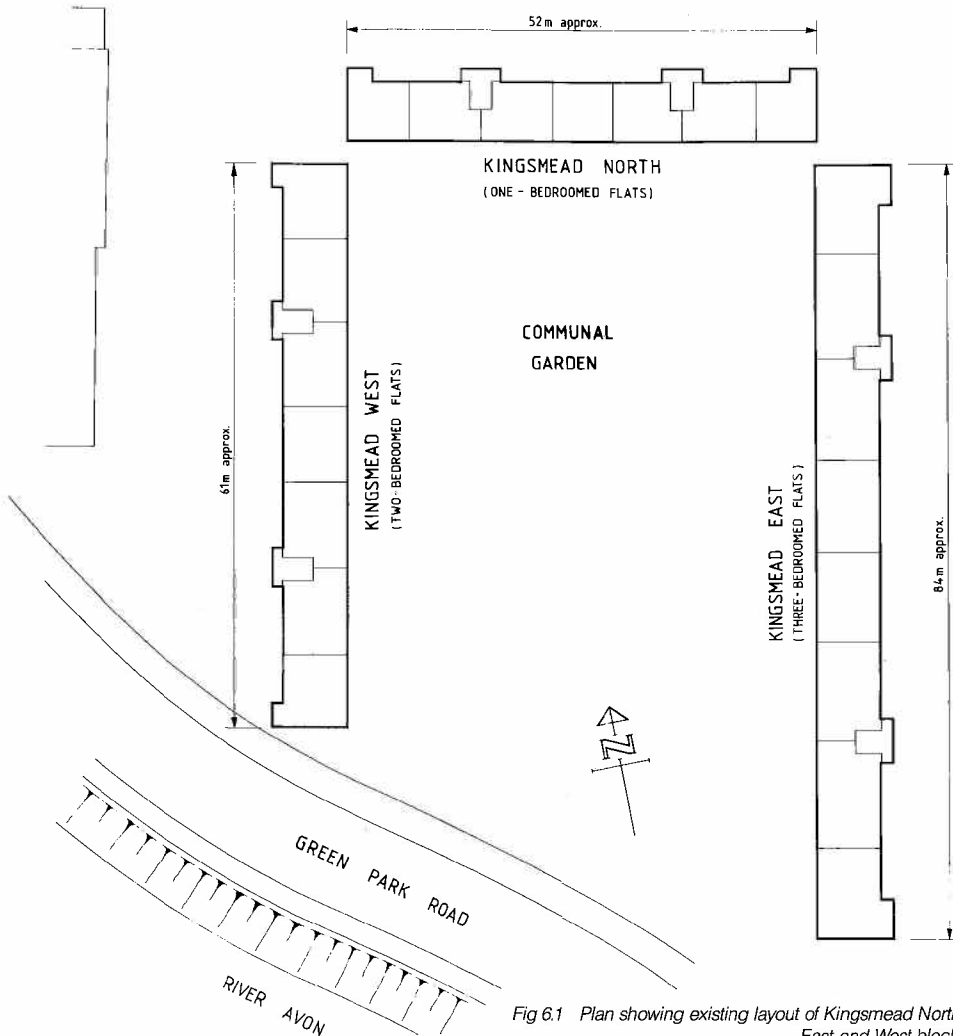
Plan showing existing layout of Kingsmead North, East and West blocks
